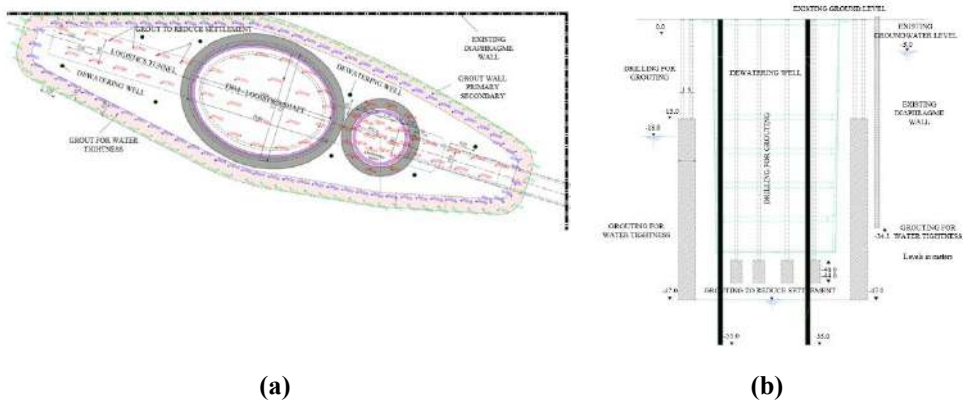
Rock grouting primary, secondary and tertiary plan (a) and section (b).
